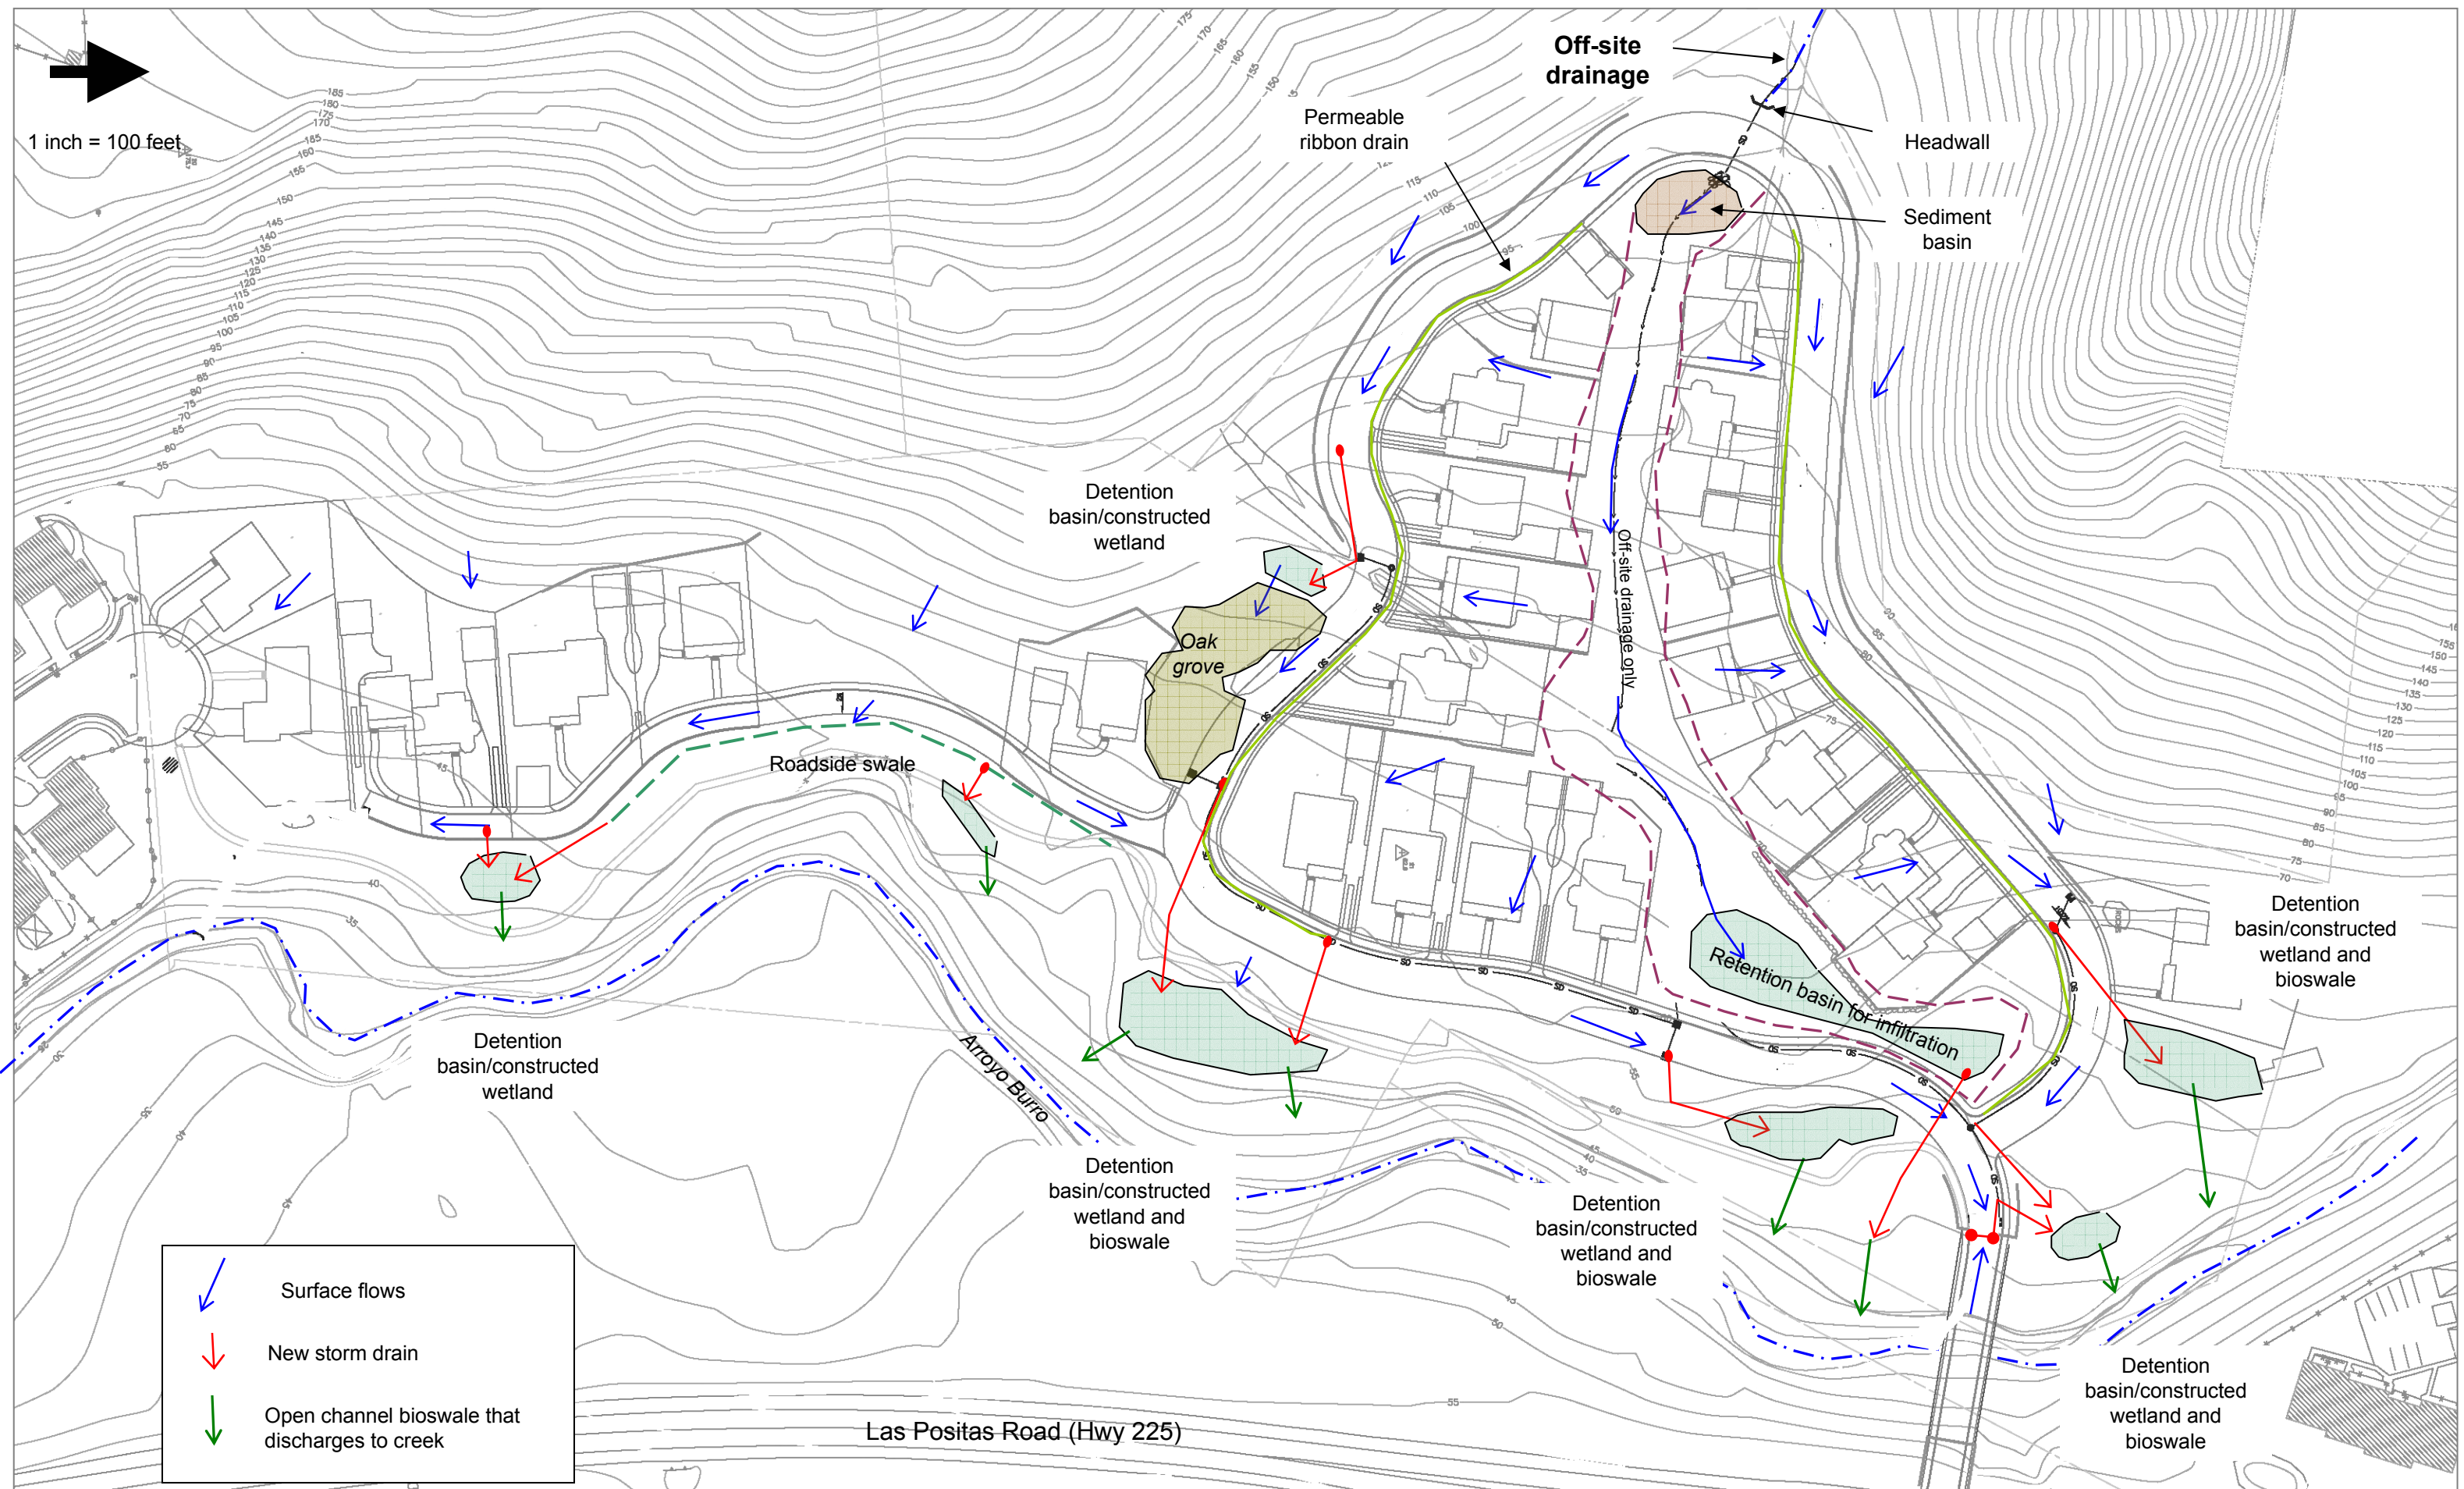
Alternative Drainage and Stormwater Treatment Plan
